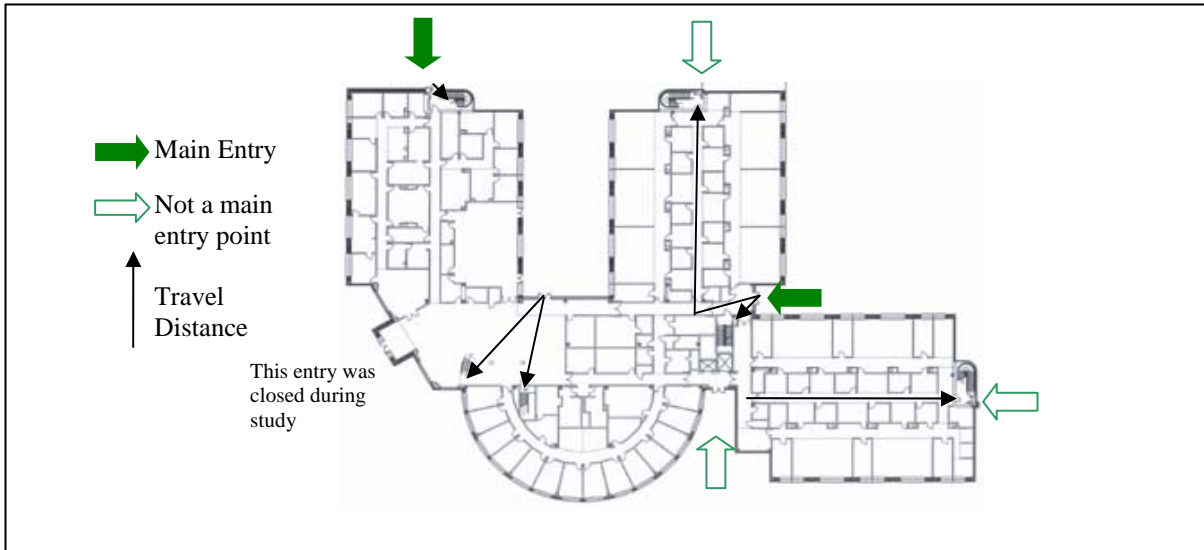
Plan indicating Travel Distance of Main Entrances for the Building GTIBB
